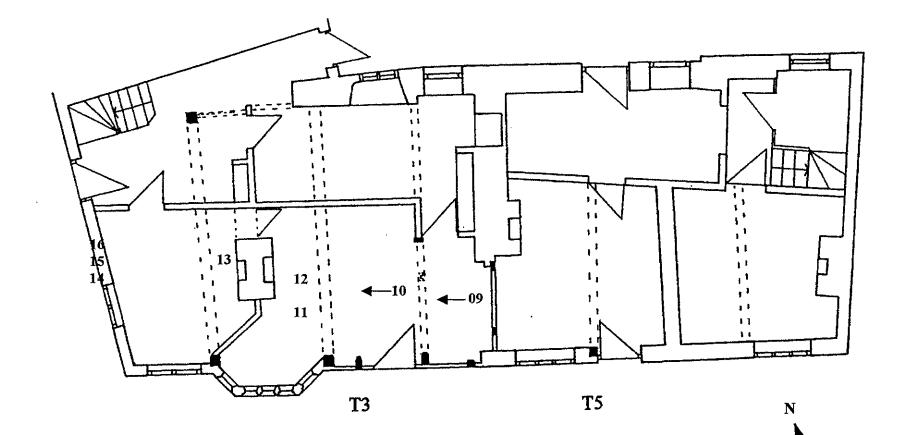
Plan to show position of sampled timbers from the ground-floor ceiling joists
